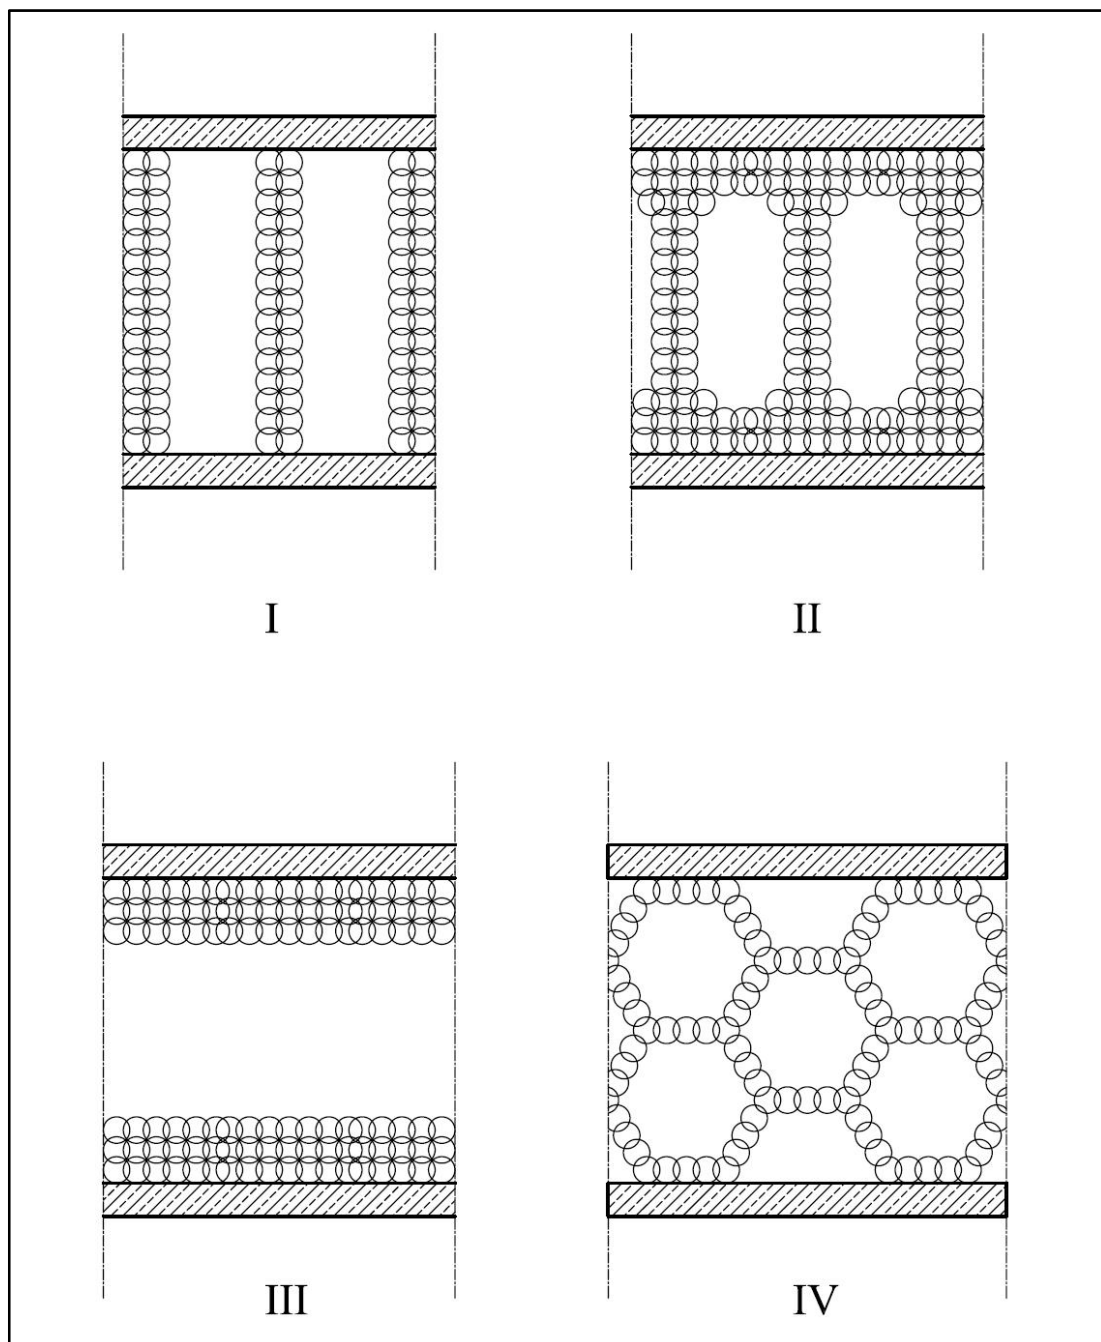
3 Schematic plan view of the jet grout patterns for clayey soil.
